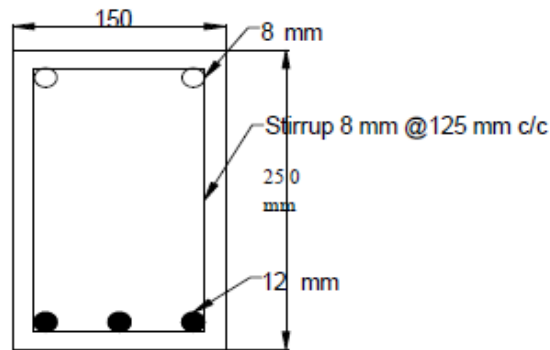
Typical cross sectional details of reinforced concrete test beams*2L
